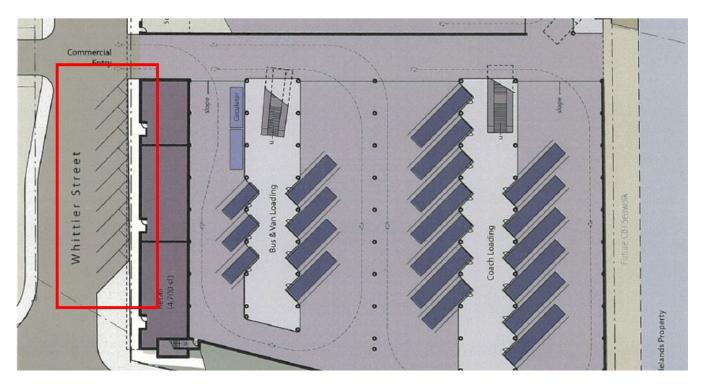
The back-out parking shown on the site plans is conceptual only. CBJ will not permit back-out parking into the right-of-way for commercial uses.
